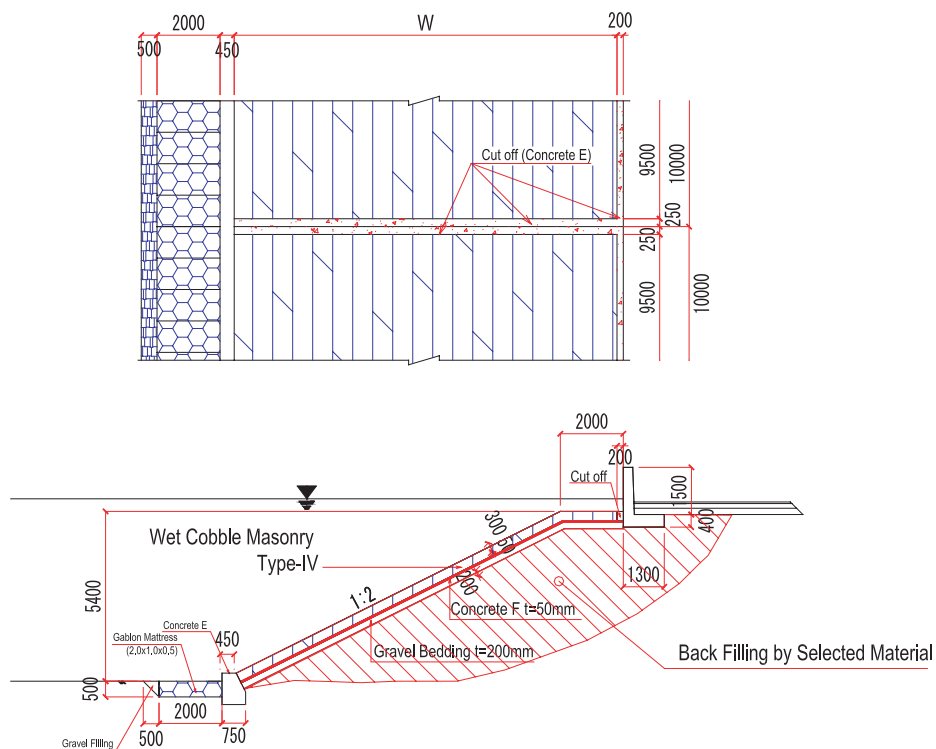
Cross Section of Wet Cobble Masonry
